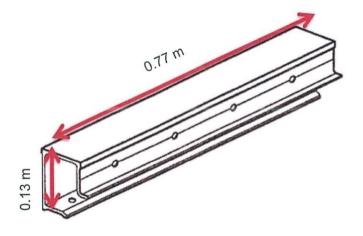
Soffit Length Source: architectjaved.com (n.d)
